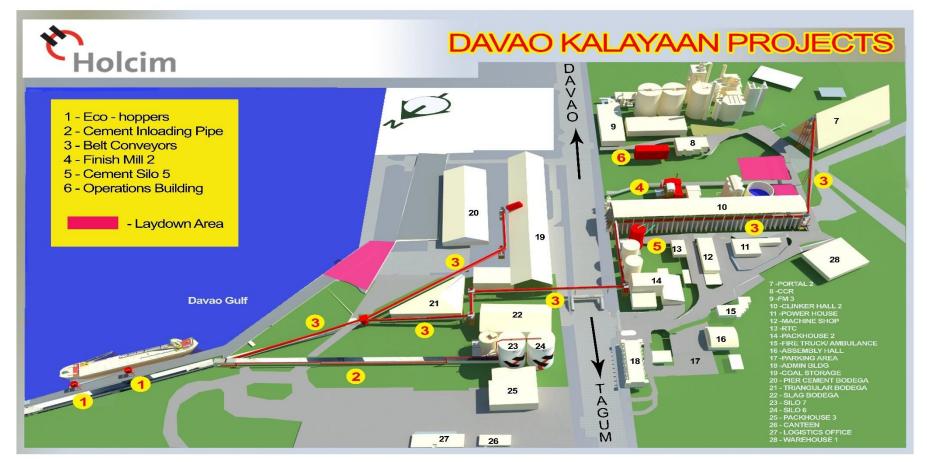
Illustration of Holcim Davao Plant General Layout with the proposed modification
